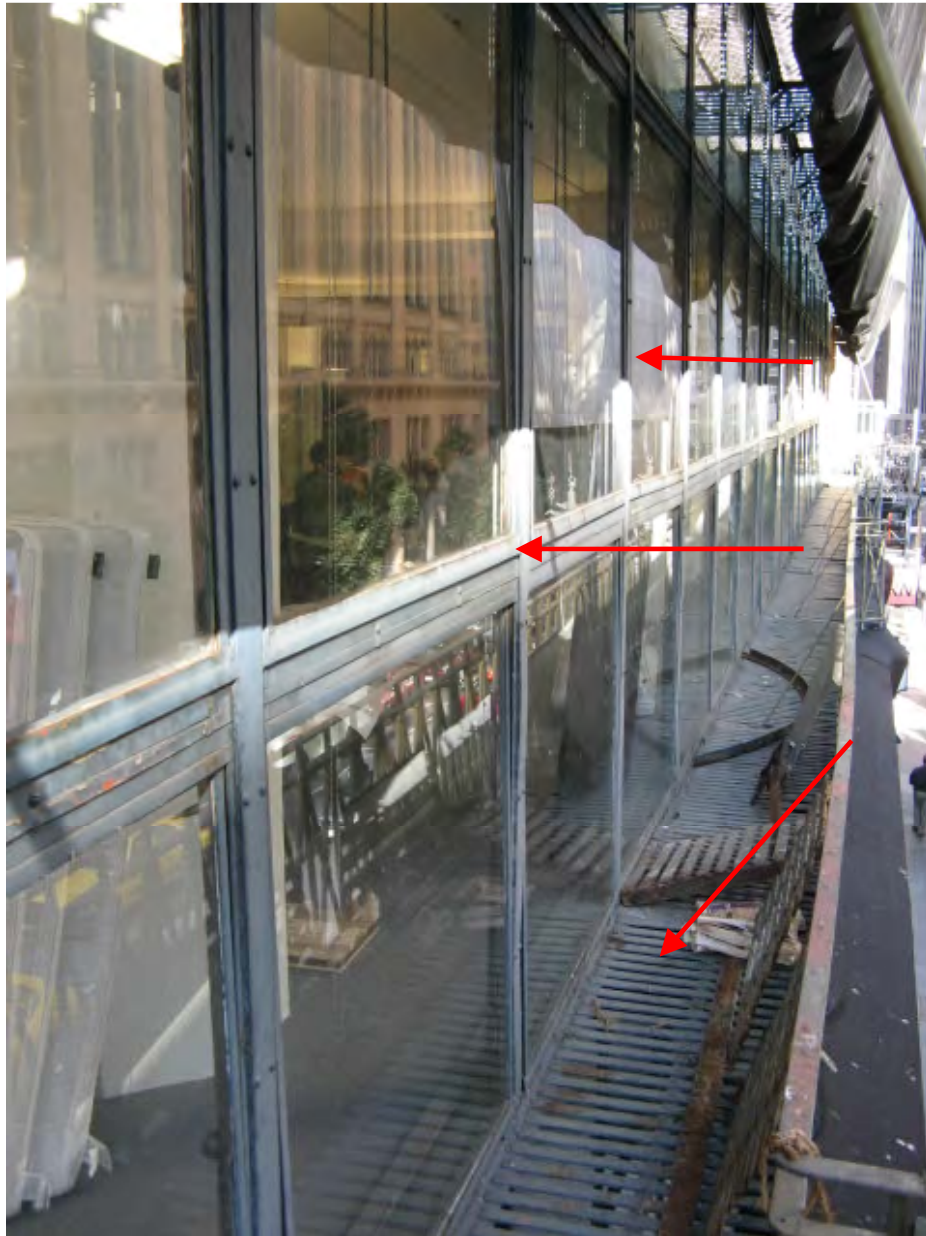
Hallidie Building, second story balcony. Red arrows denote the location of paint samples taken from mullion, window frame and balcony.
